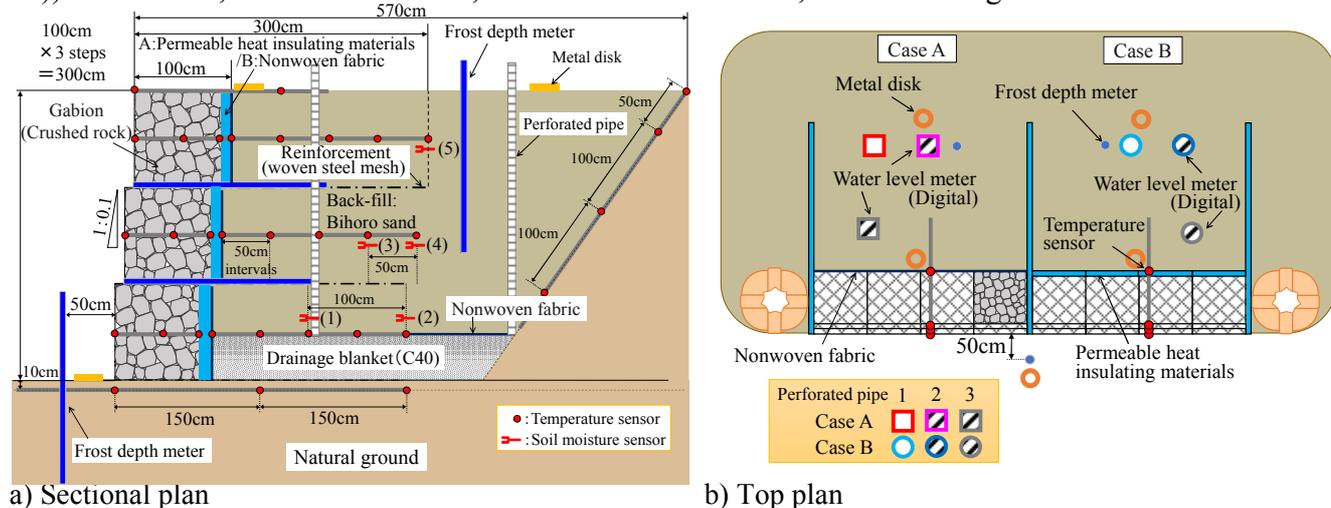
Sectional and top plan of gabion faced reinforced soil walls
